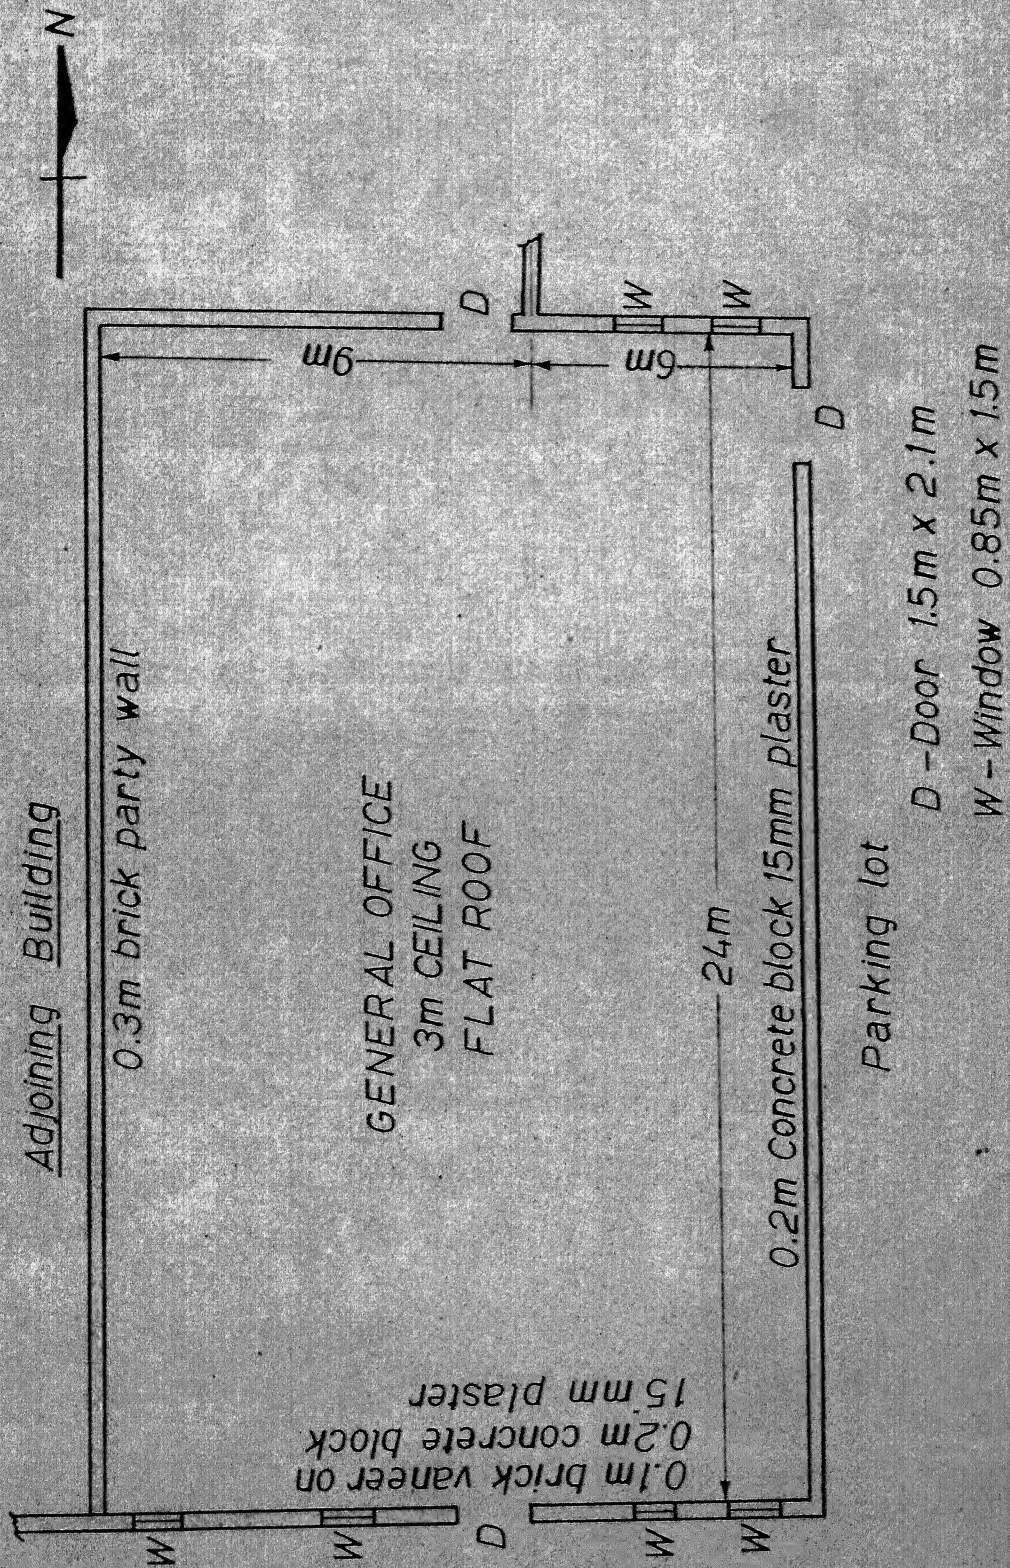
PLAN OF ONE STOREY OFFICE BUILDING
